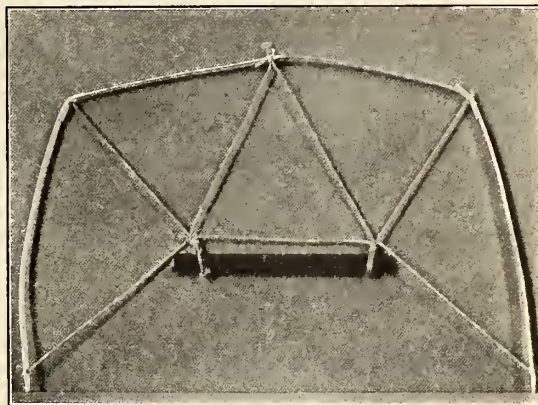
A PAPER-AND-STRING MODEL OF A TRUSS BRIDGE.
